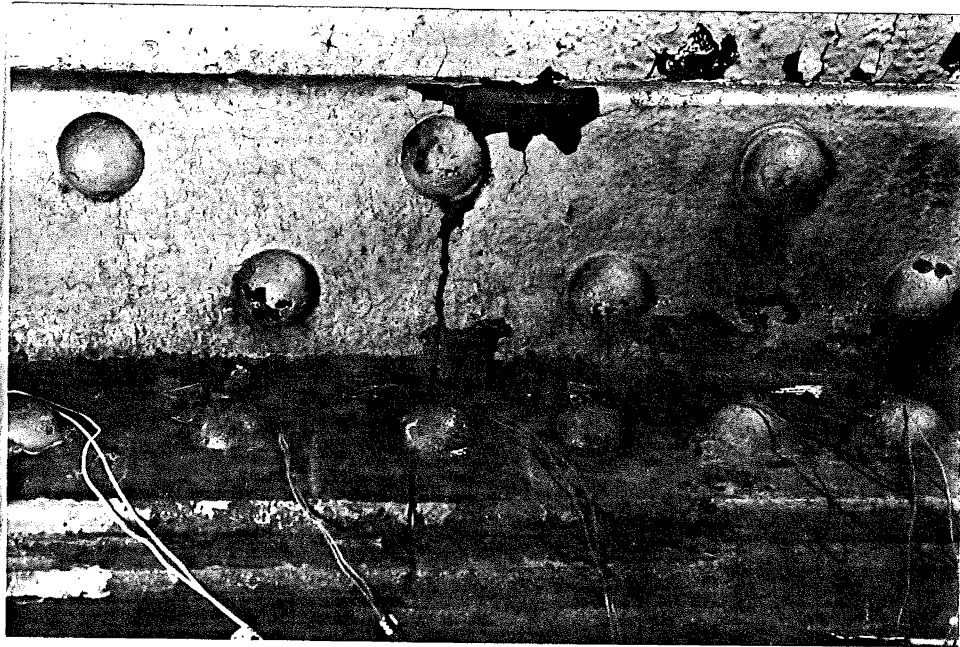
Girder No. 14 at 1,563,000 Cycles
